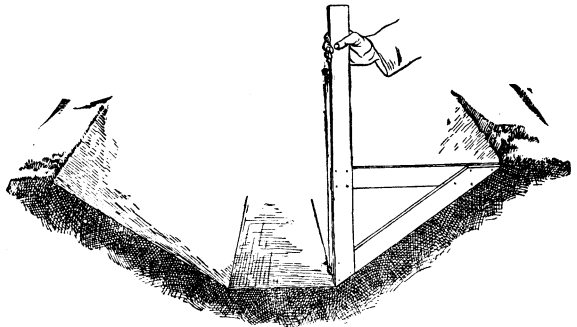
Proper form of surface ditch, showing manner of construction.
